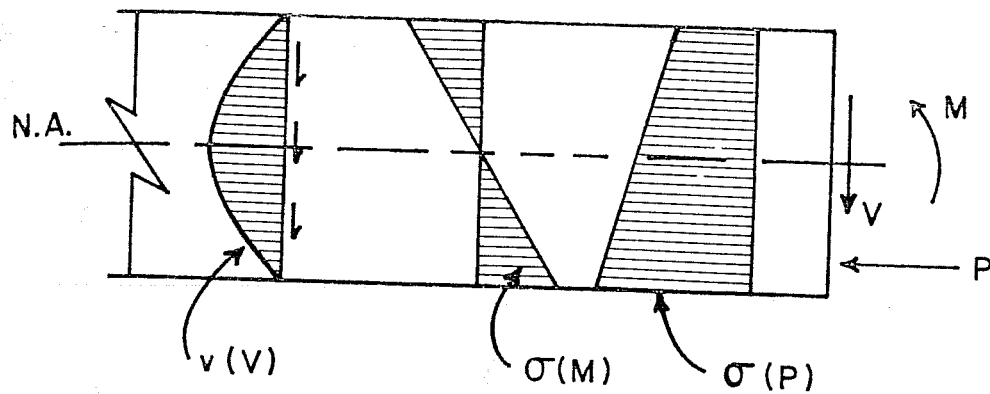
State of stresses in an uncracked prestressed section
